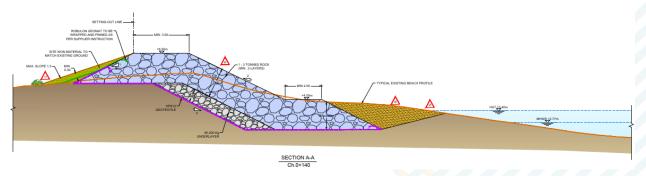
Cross-section of proposed works at Stinking Porth (HR Wallingford, 2022)
